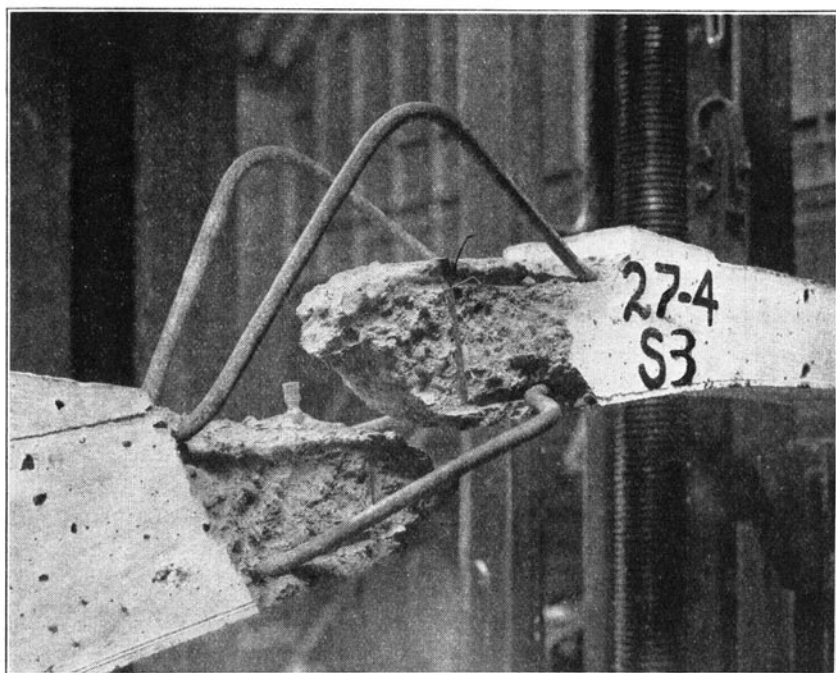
COMPRESSION FAILURE OF ARCH 27-4 AT SECTION S3
